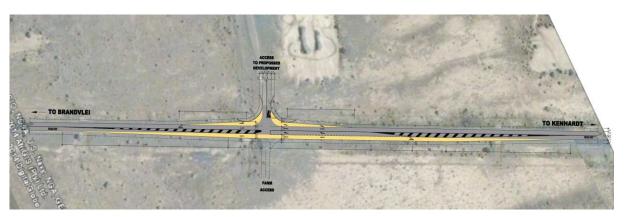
Proposed road layout at junction of Soafskolk Road with the R27
